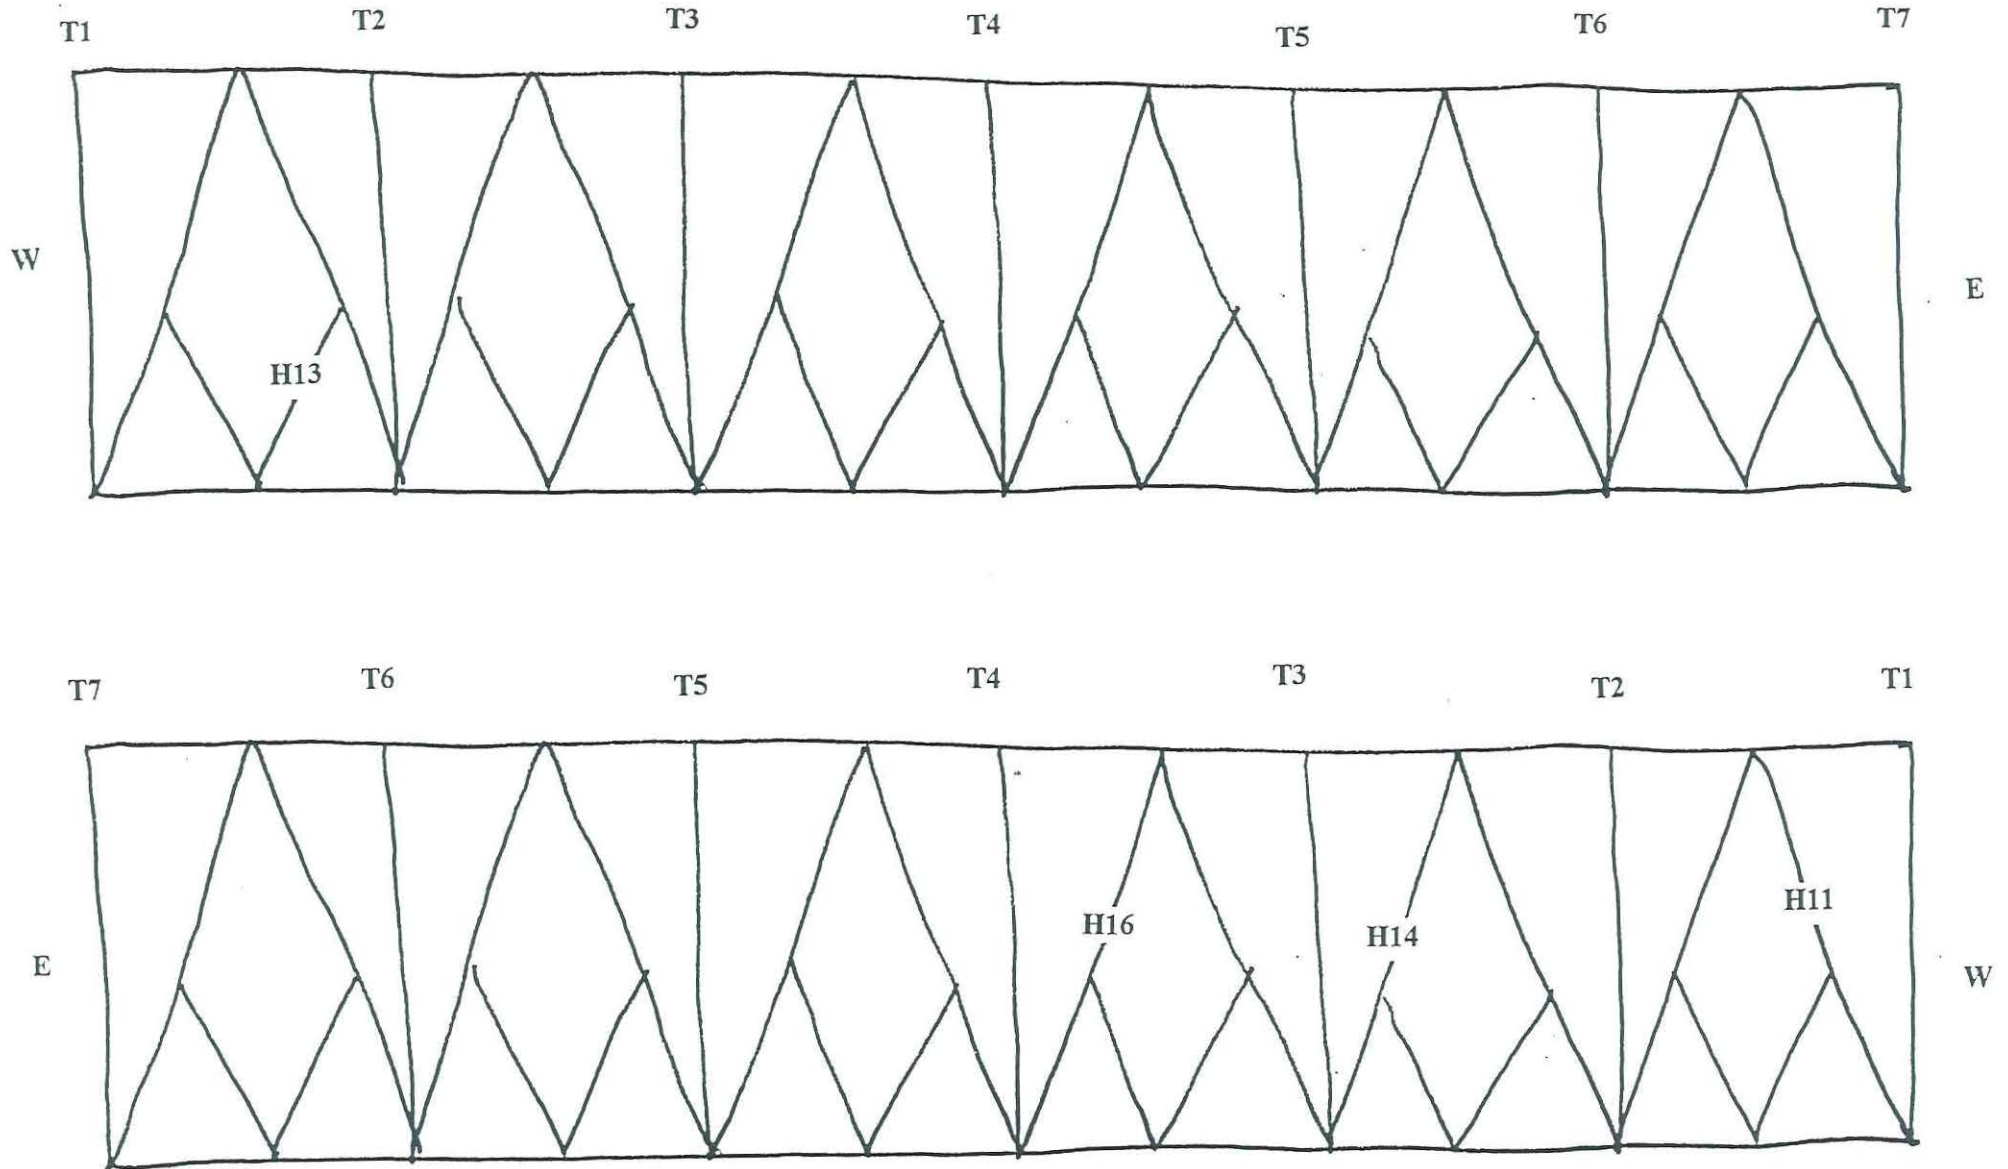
Sketch drawing to show positions of samples from the stairs of the gatehouse
